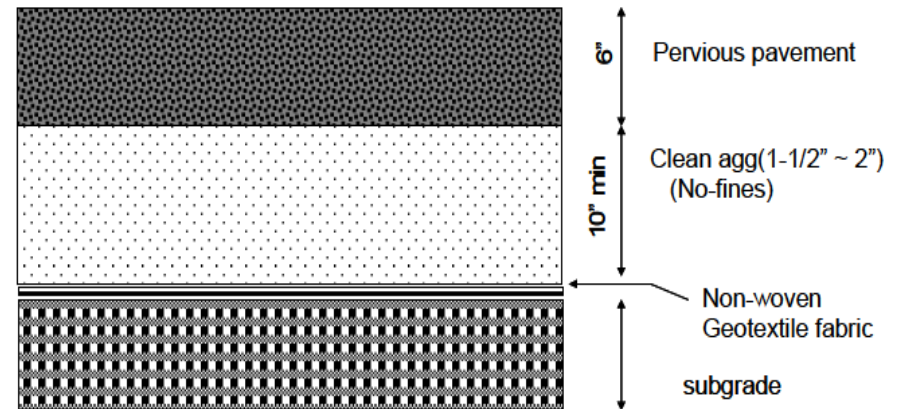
Pervious Concrete Design for Heavy Traffic, after (www.stonecreekmaterials.com)
